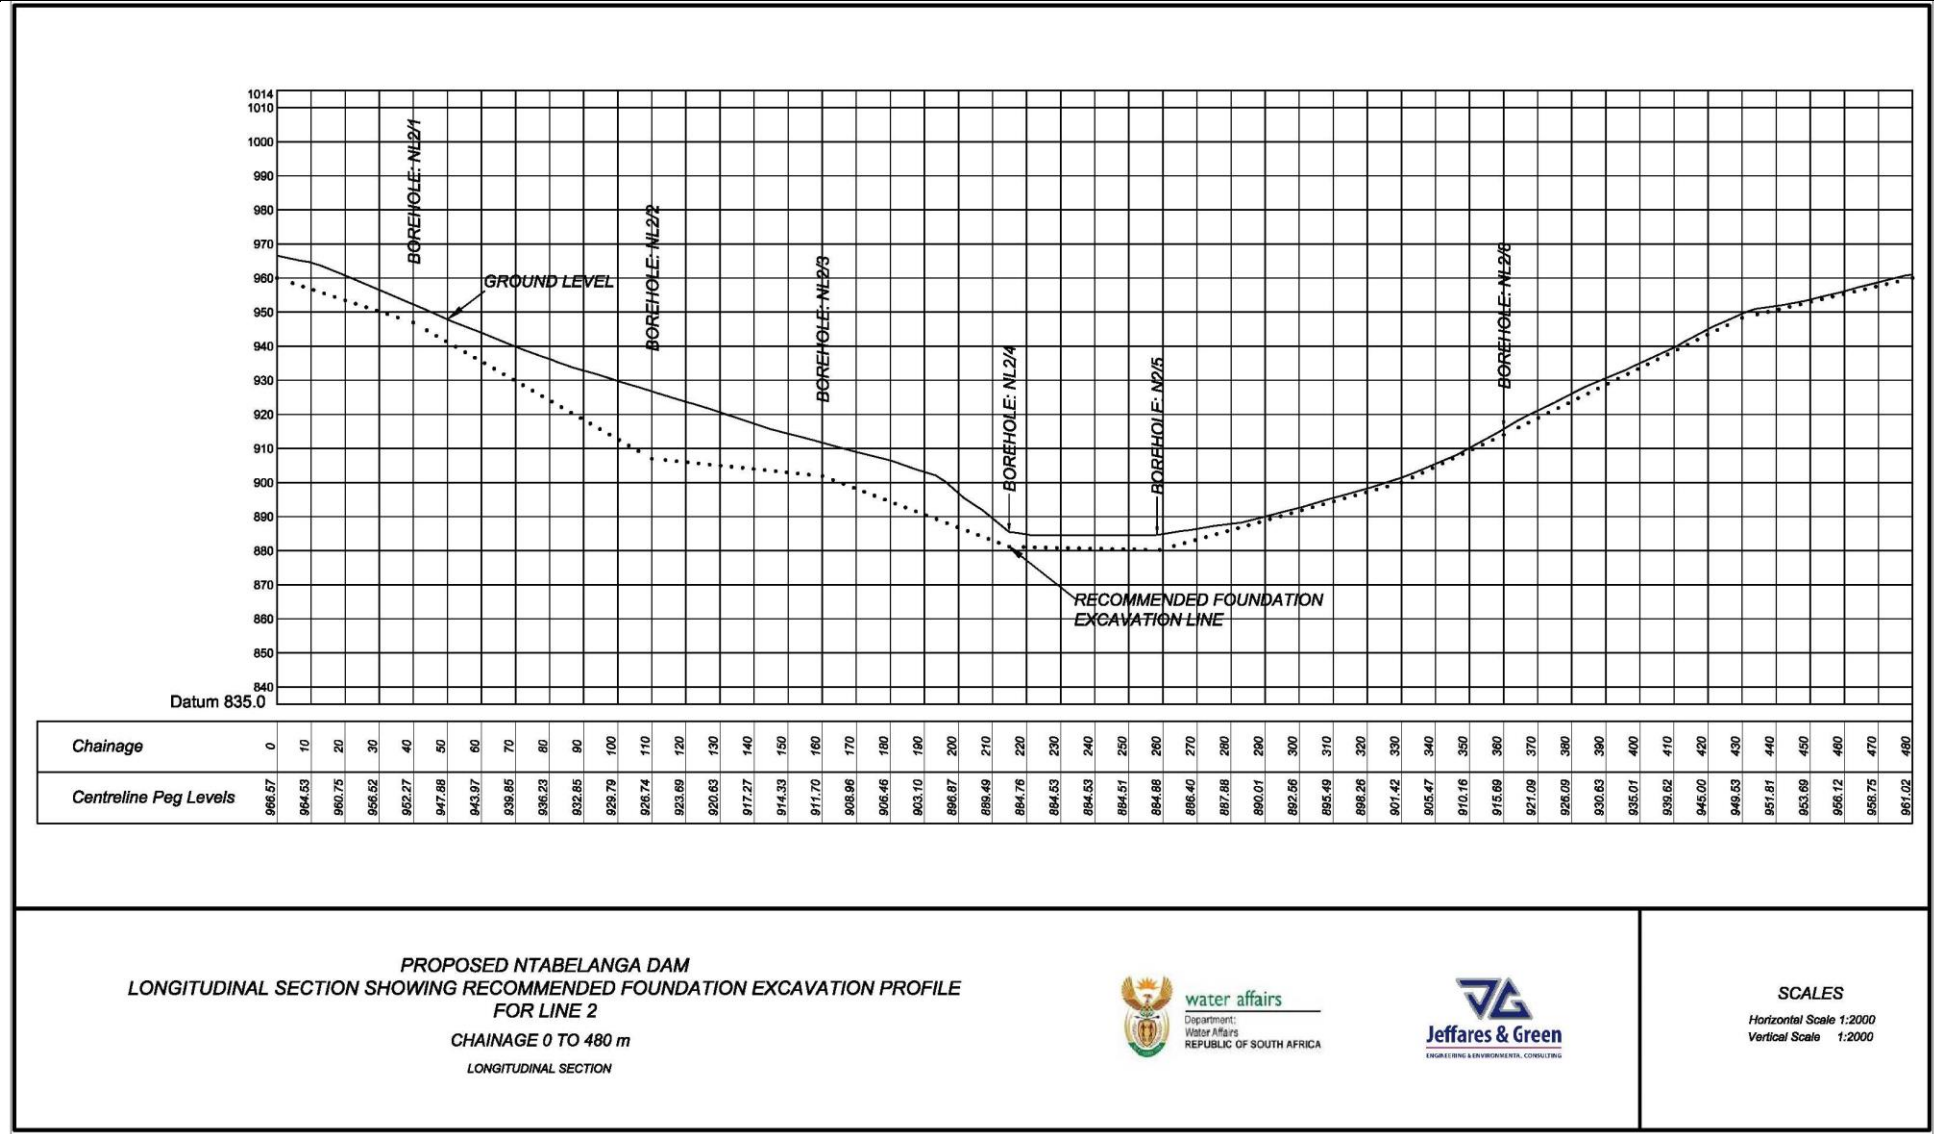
LS - Recommended Foundation Excavation Profile for Line 2
